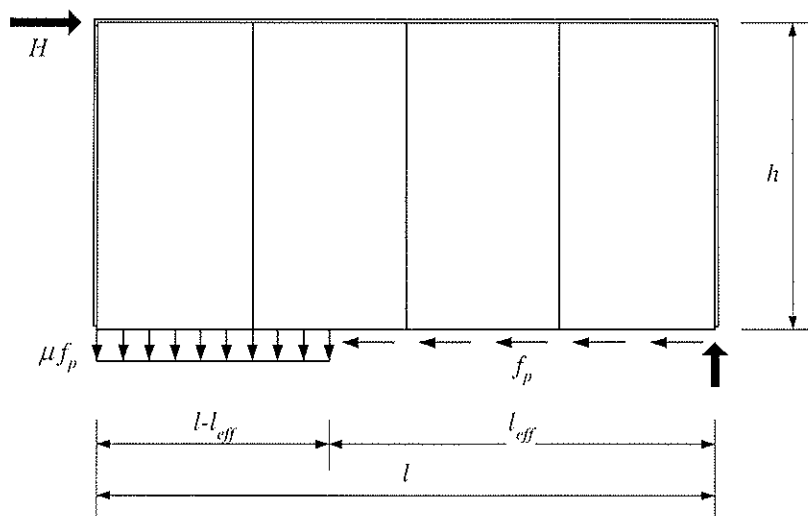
Forces acting on a shear wall in the case of a fully anchored bottom rail.
